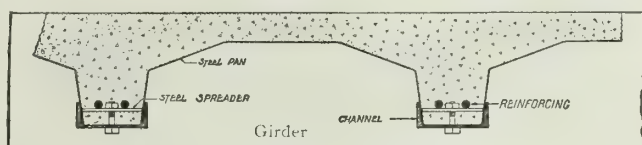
BEAM AND JOIST CONSTRUCTION TO REPLACE BEAM AND GIRDER
